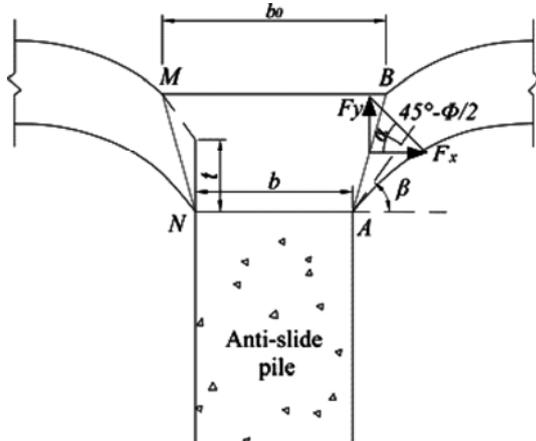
Inverted trapezoidal compression zone calculation mode.
